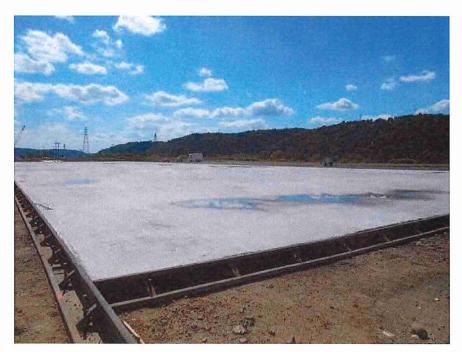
Typical view of concrete pad installed over No Dig Zones 1, 2, and 3
